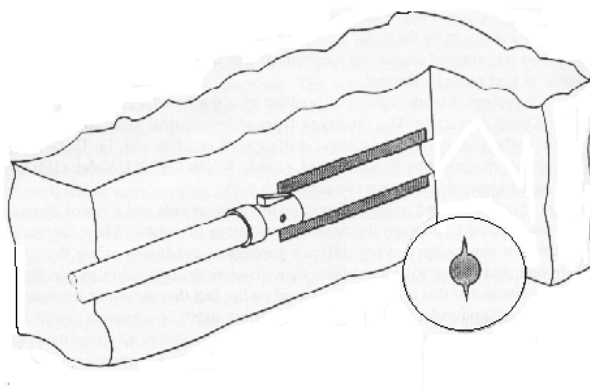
Operation of Fracturing by Means of Threaded Drillhole [2]
